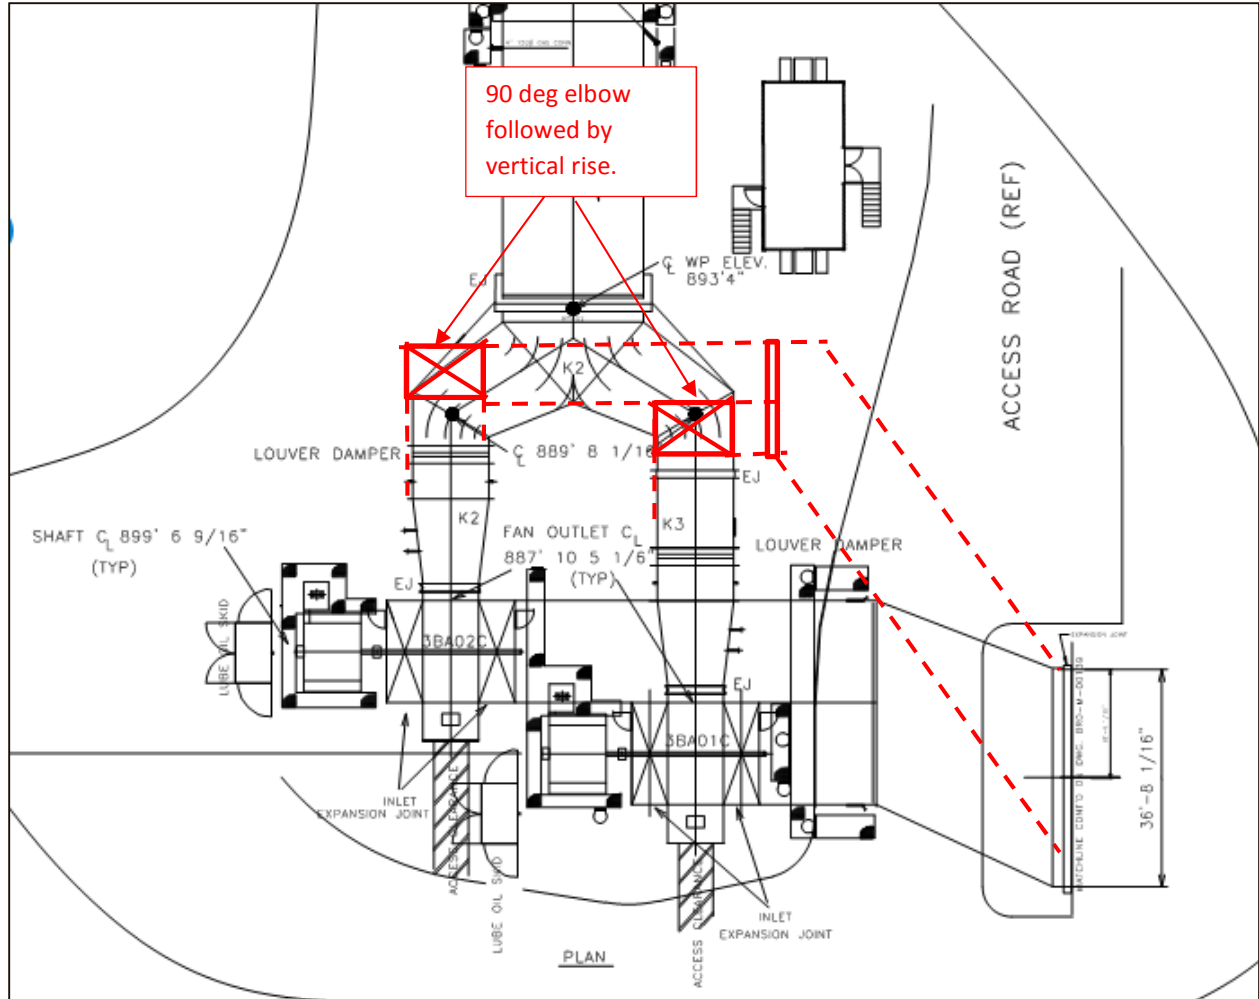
Unit 3 ID Fan Outlet Duct Layout
